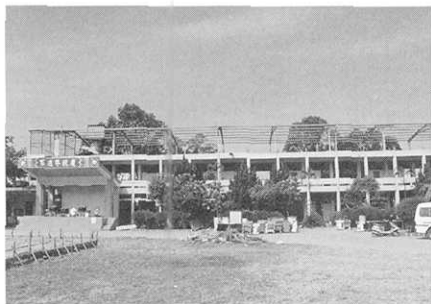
Building C of Shikang National Elementary School, which was severely damaged
